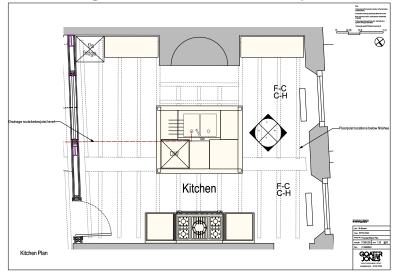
Approved Drawing of floor plan to kitchen in Room G1 from application to 09/0292/DD01 (2018) by Goater Jones Architects
